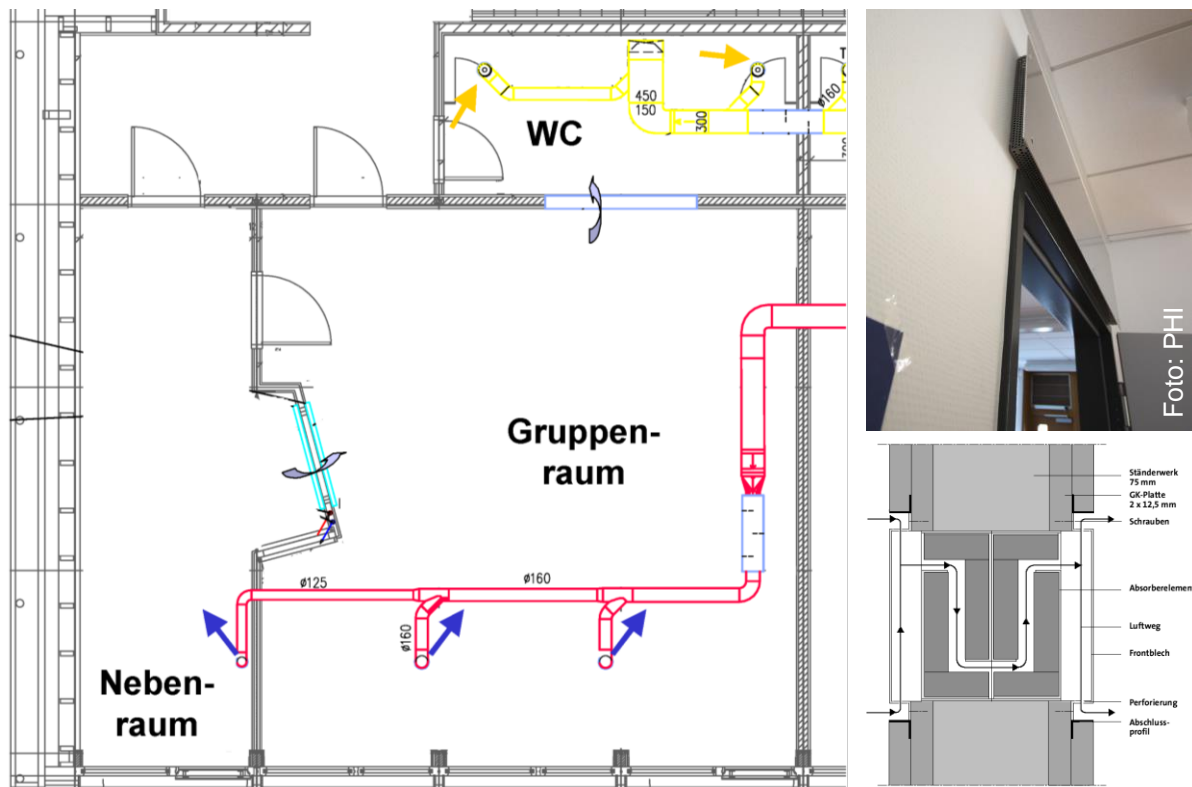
Ventilation concept in der children's day-care centre in Schwanheim. The picture on the right shows the air transfer element. Sketch of the elements used (Westaflex Typ 400). Architecture: sdks, Darmstadt / Building Services: IB Gernet, Oberursel
